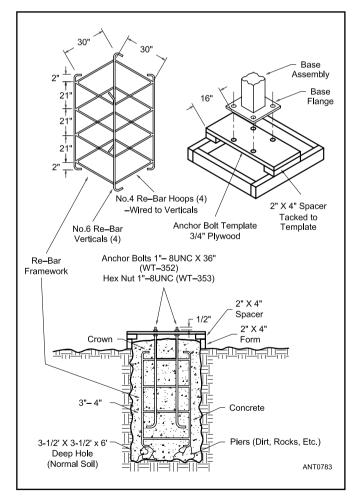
Plans for installing concrete base for a 70foot tubular crank-up tower. Although the instructions vary from tower to tower, this is representative of the type of concrete base specified by most manufacturers.
